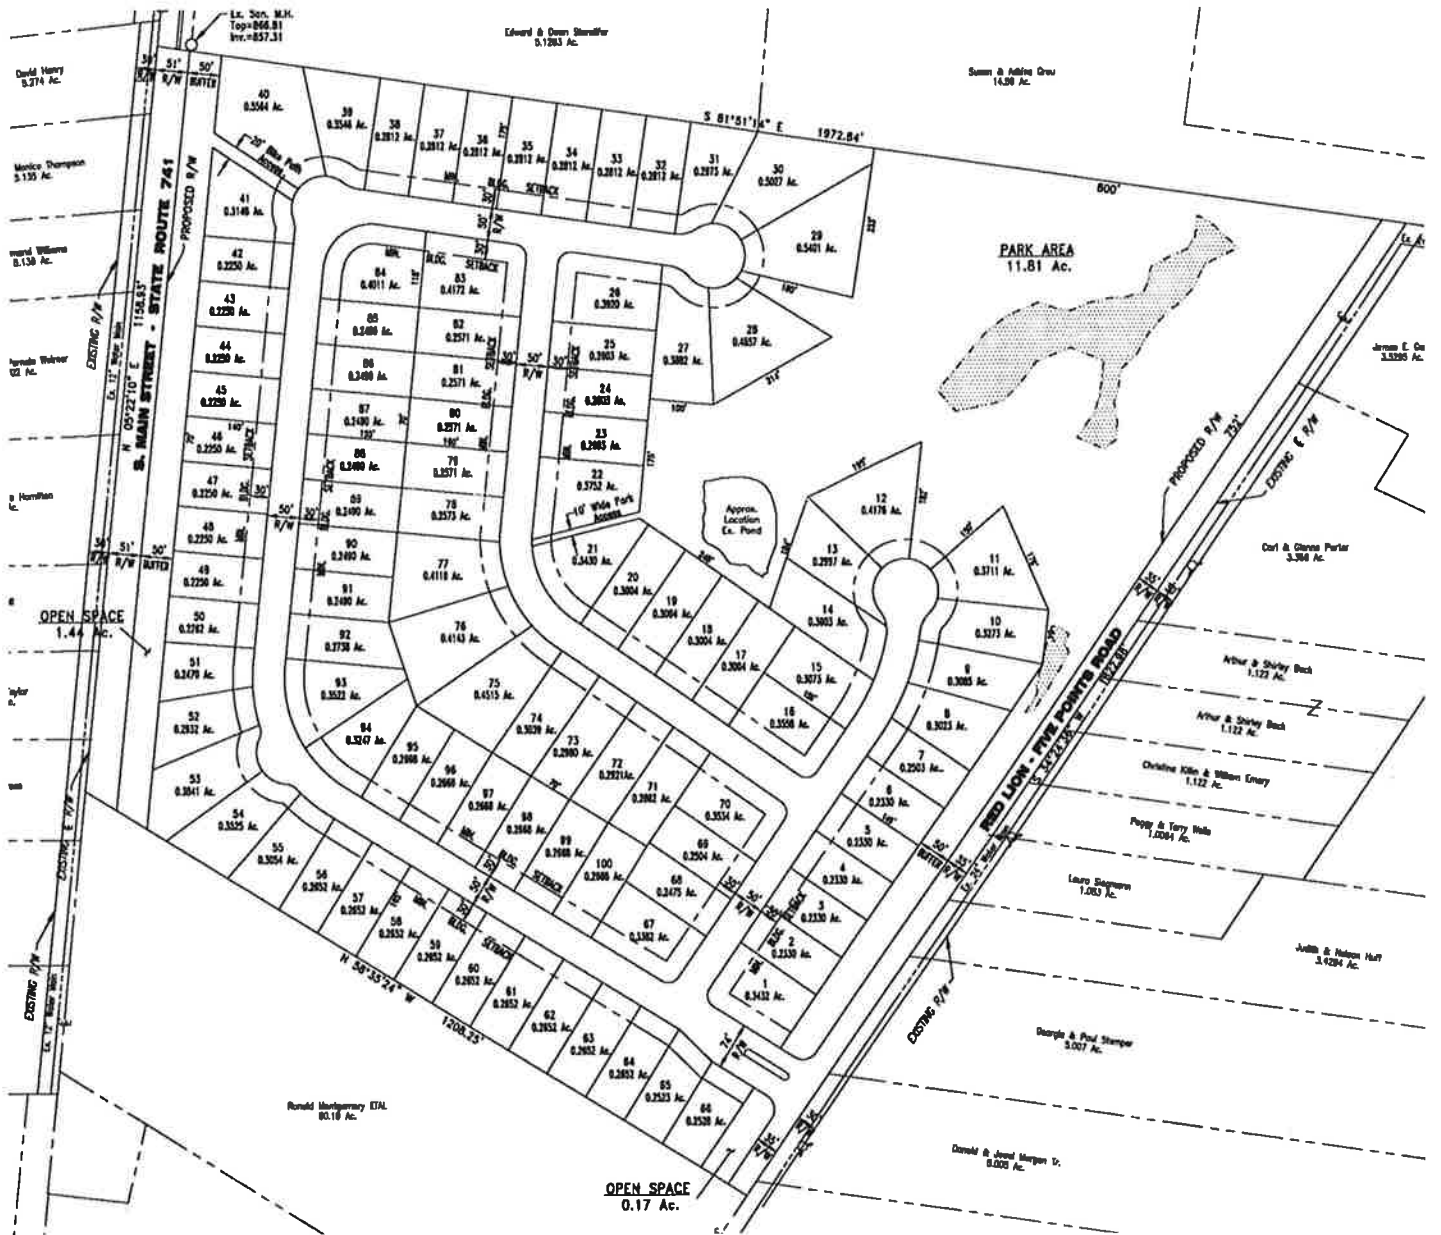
EXHIBIT B – Original P.U.D. [Concept] Plan (received by RPC 11/1/18)
